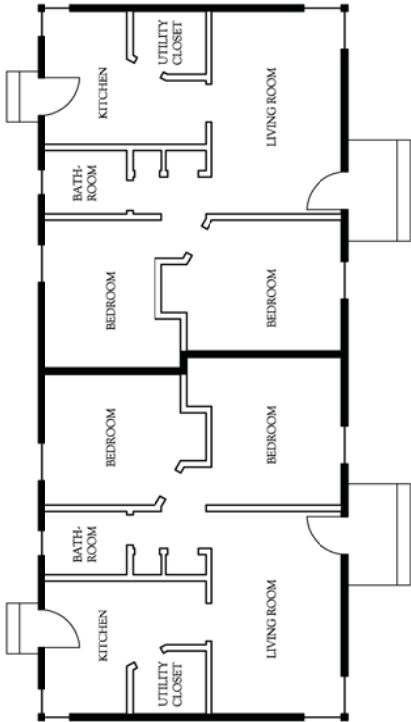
Floor plan of Residential Unit Type 2 (not to scale).
